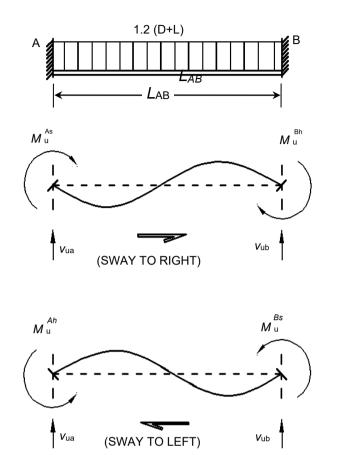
FREE BODY DIAGRAMS OF A BEAM SHOWING EQUILIBRIUM SHEAR FORCES INDUCED WHEN PLASTIC HINGES ARE FORMED AT THEIR ENDS, WHEN THE STRUCTURE SWAYS TO THE RIGHT AND TO THE LEFT
